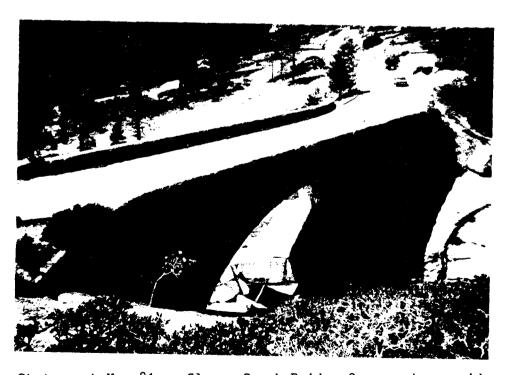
Stone masonry culvert; upstream side (4.55 miles above Giant Forest Market)
